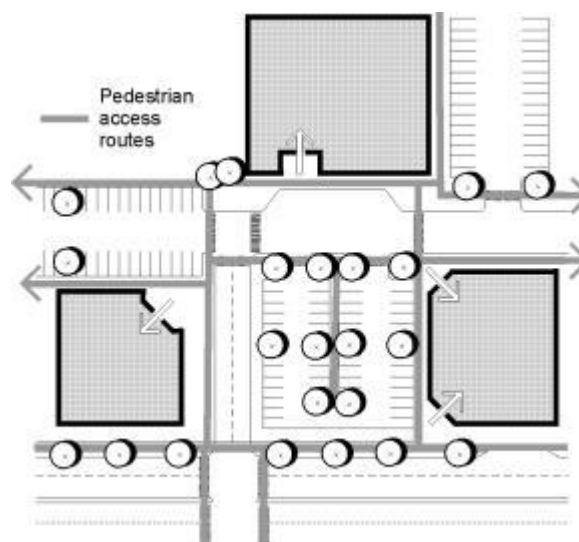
Good internal pedestrian circulation. Note connections from the street, between buildings and through parking lots.
